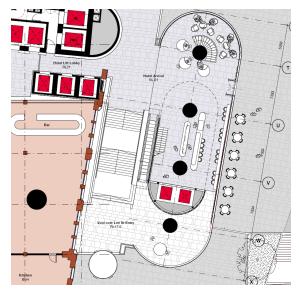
General Arrangement Ground Level, Drawing no. 10GR1000
